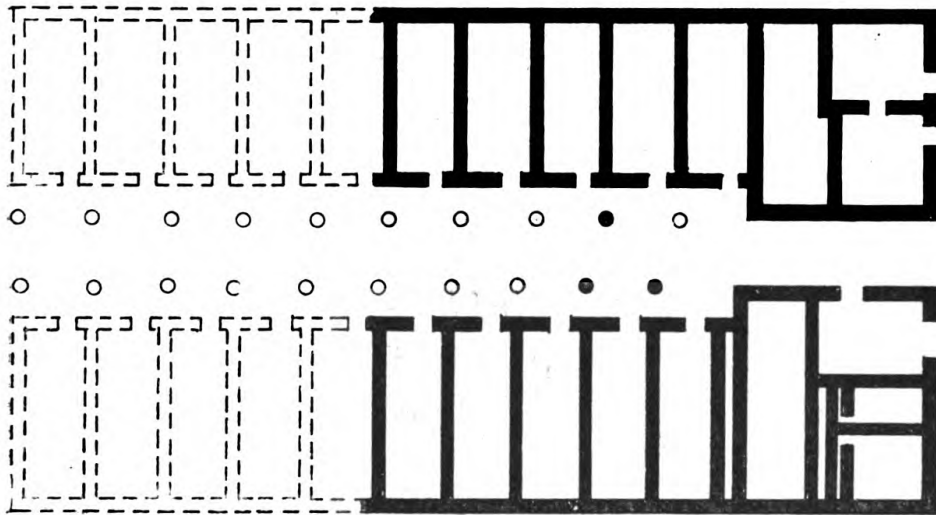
PLAN OF "L-SHAPED" BUILDINGS AT CHESTERS.
